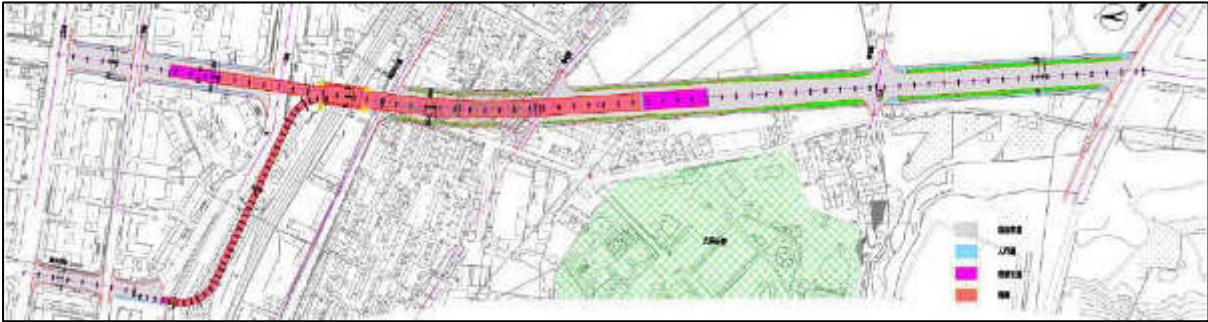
Plan design of Xinxing Avenue Flyover (SY)
